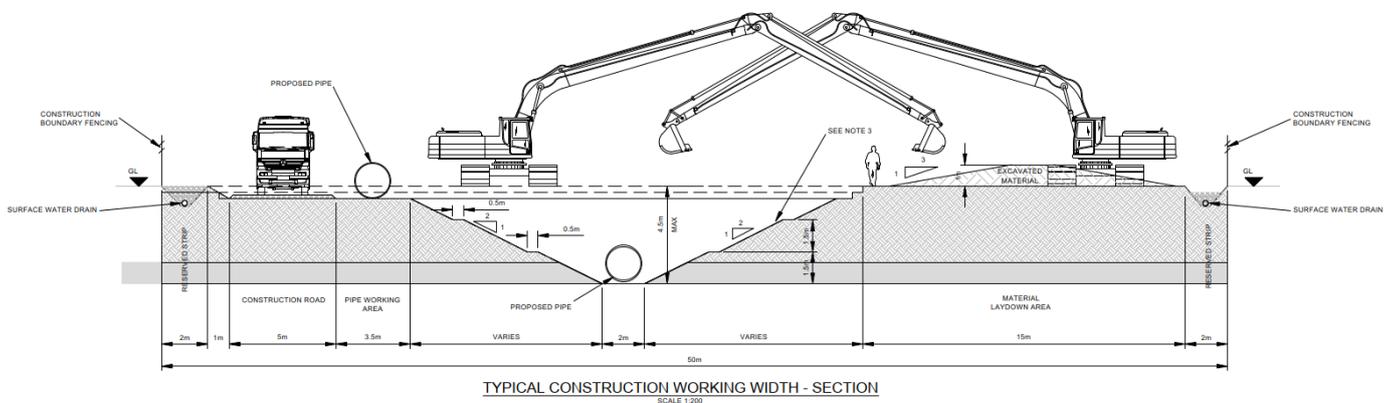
Indicative Construction Working Width Cross Section in Peat Areas
